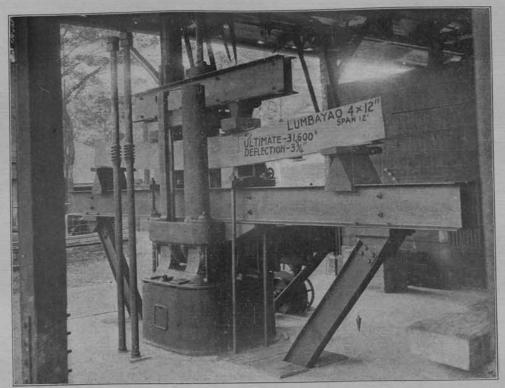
TESTING MACHINE EQUIPPED FOR TIMBER TESTING.
